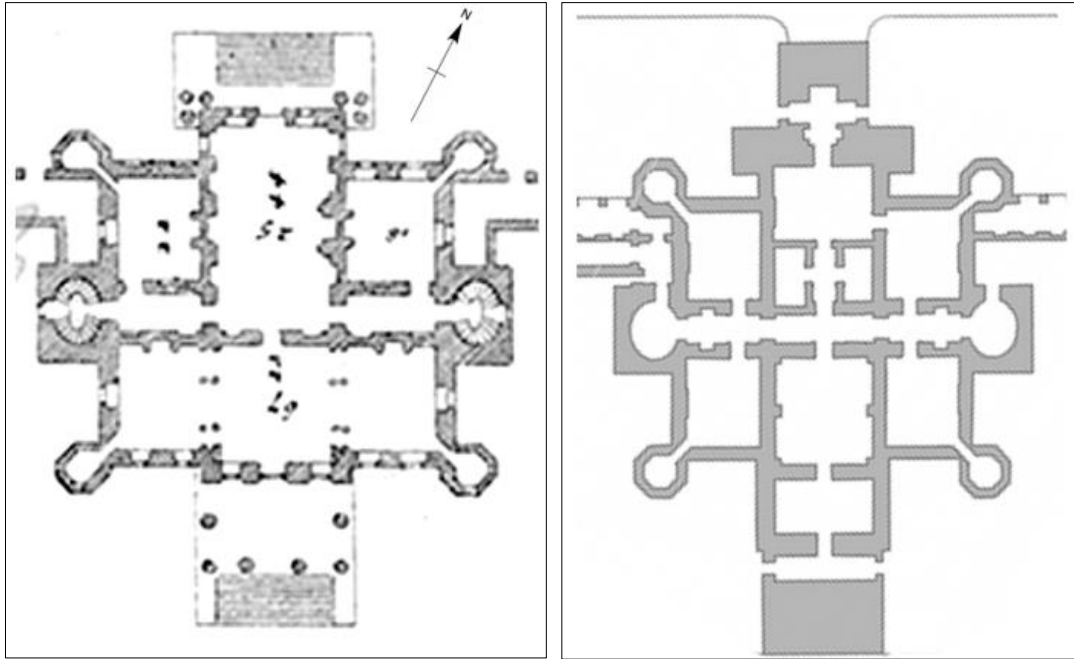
1725 plan of the Central Hall compared with a modern survey of the building.
